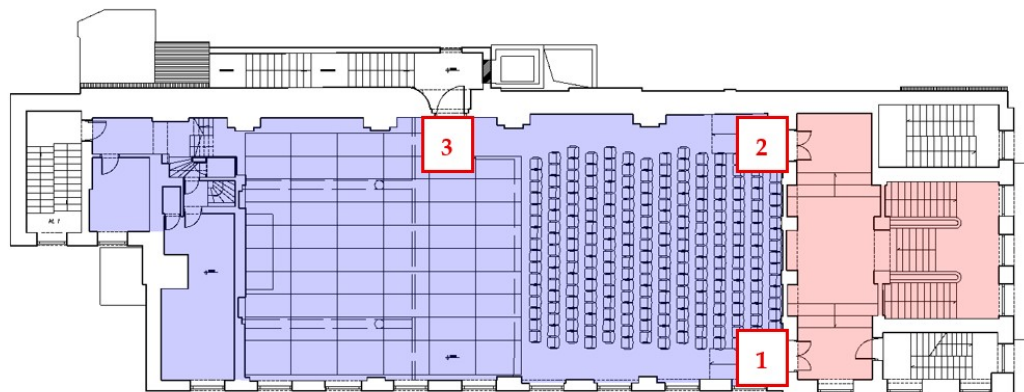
Floor plan of the auditorium and stage with marked emergency exits.
